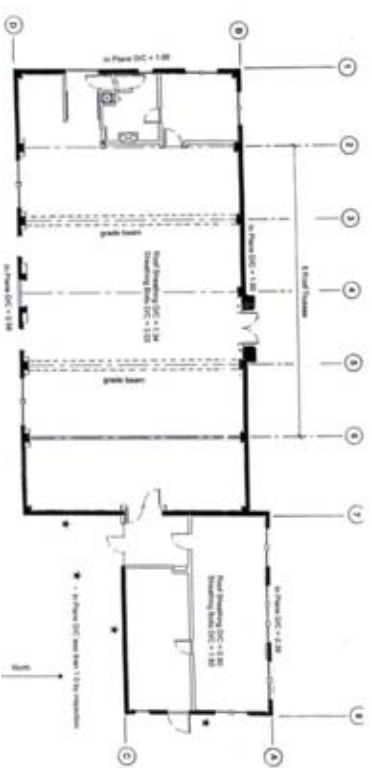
Floor plan of the Student Center. Demand to capacity ratios (D/C) for the principal shear walls are also indicated.
